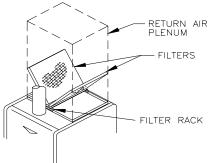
Air filter mounting location for the OC2-5 furnace.
